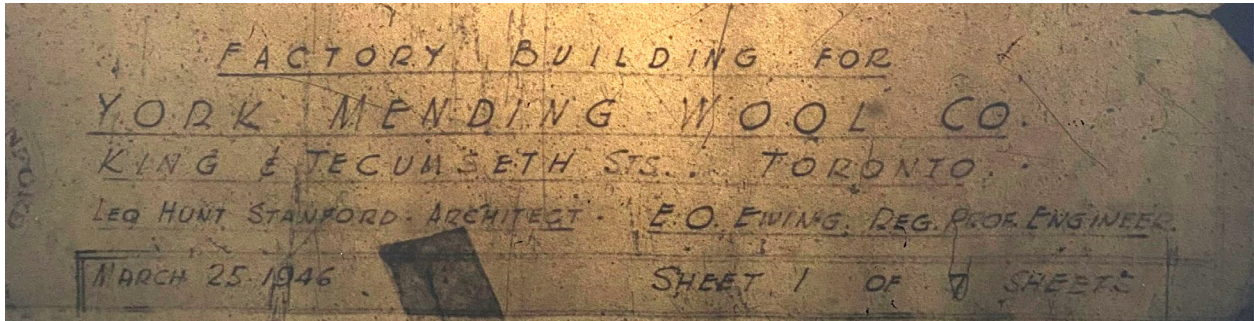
Detail from building plans for 778 King Street West by Leo Hunt Stanford Architect, dating to March 1946.
